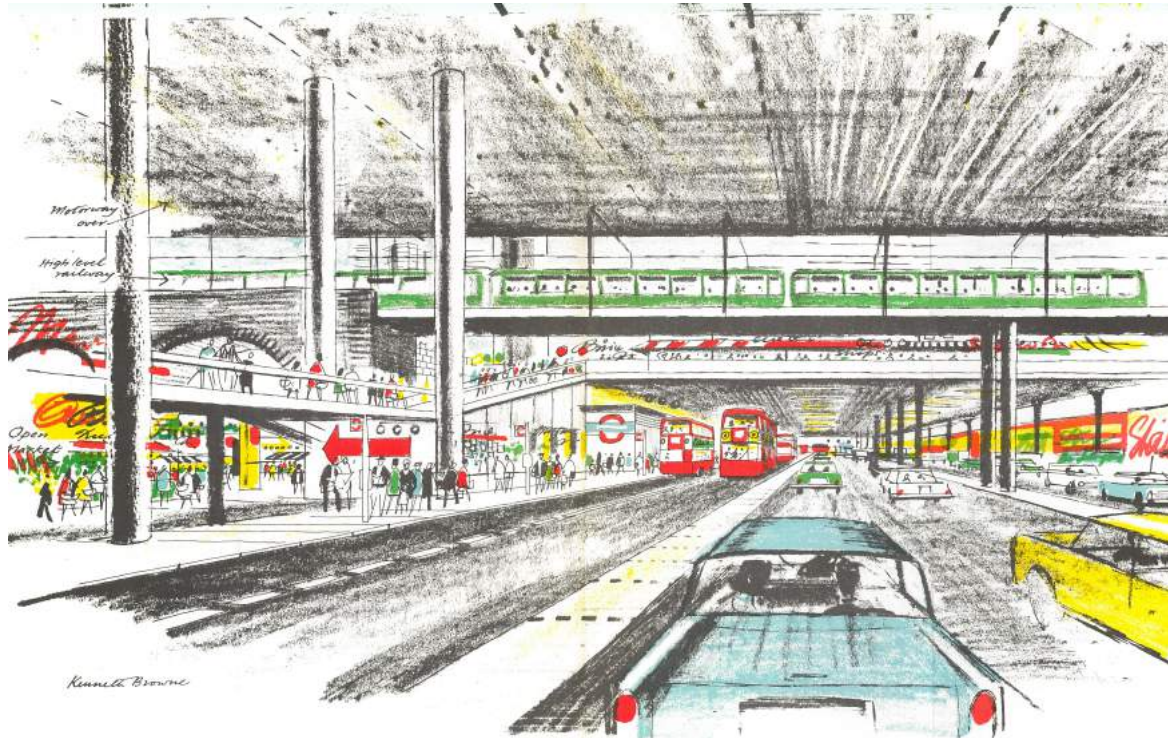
Architectural studio artist's impression of Brixton at street level post-redevelopment, with an elevated motorway passing over it. As with the previous illustration, it appeared in a 1967 report outlining Lambeth Council's redevelopment plans (London Borough of Lambeth, 1967).
